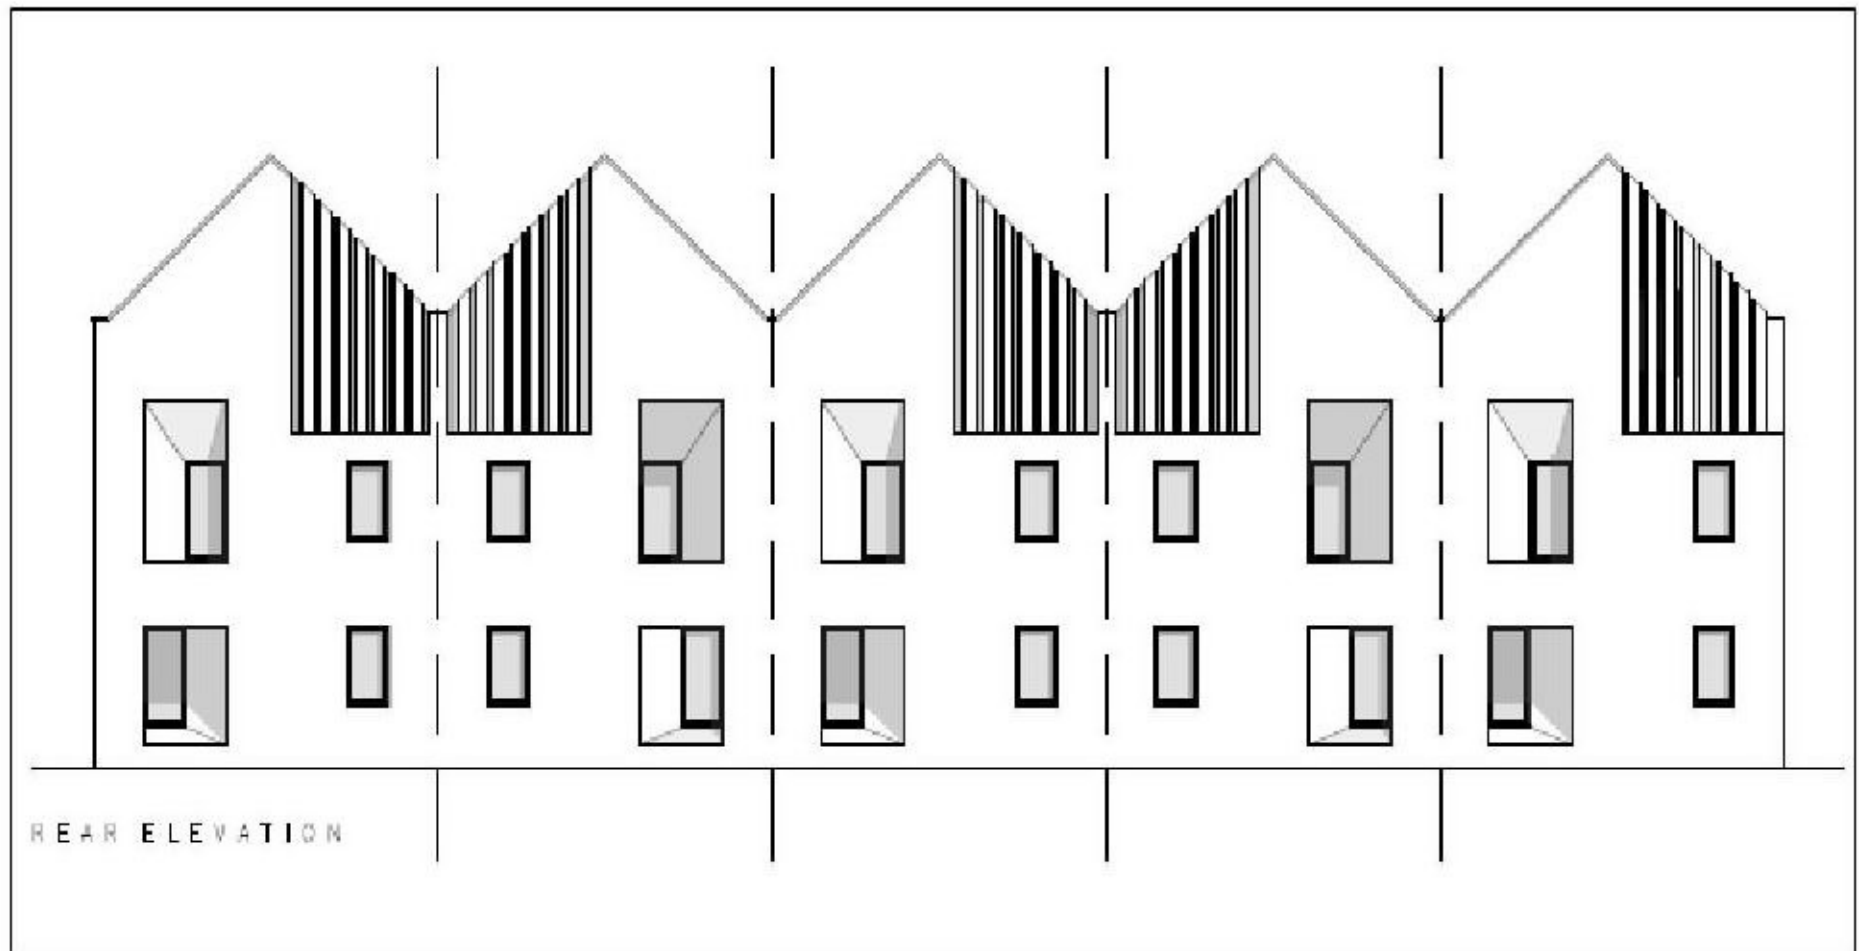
Proposed rear elevations, drawing provided by Rickett Architects Ltd
